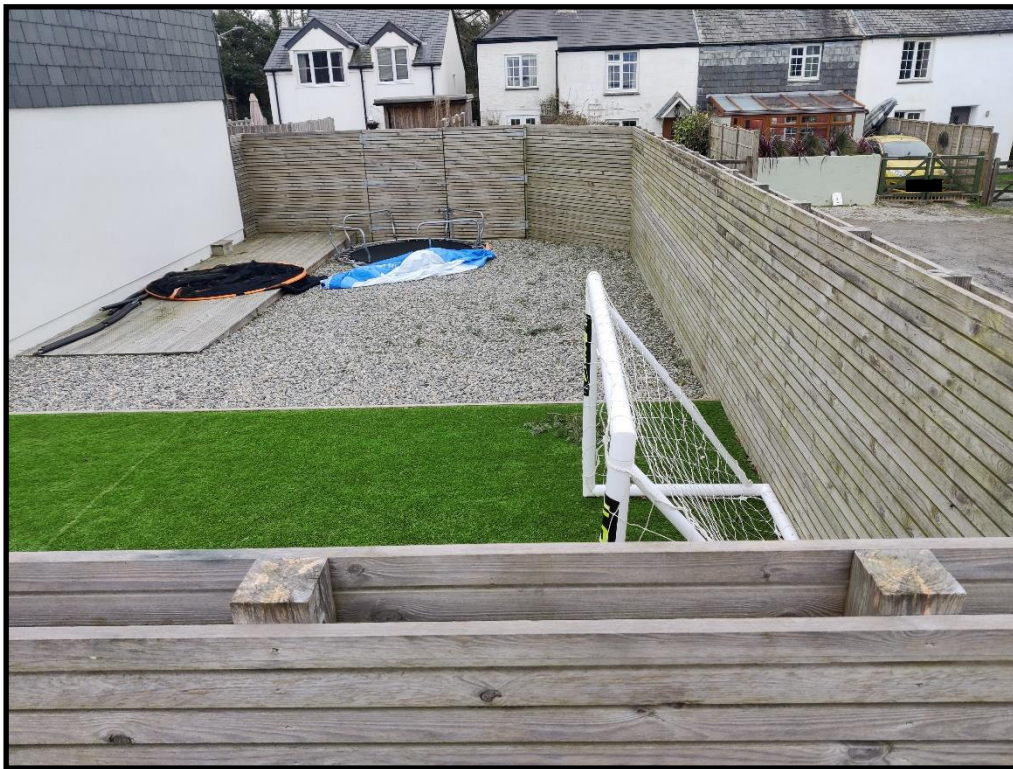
View from the southwest corner looking north/northwest across the site and the adjoining land.
